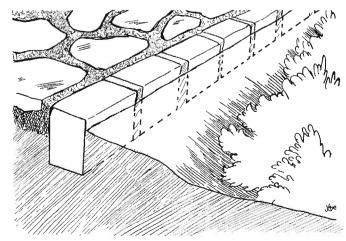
Stabilized edging (curb) for a porous pavement of salvaged concrete set in gravel
